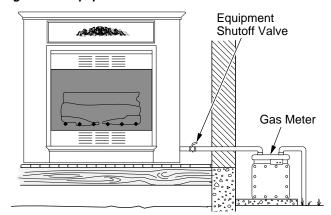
Checking Gas Joints (Shown with Optional Mantel)
